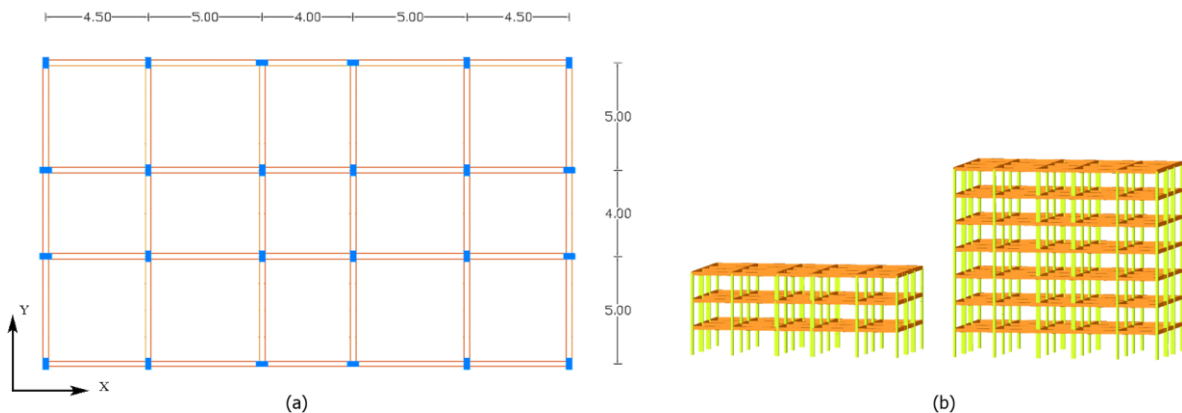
a) Structural plan (units in m); b) Elevation view of the frames
